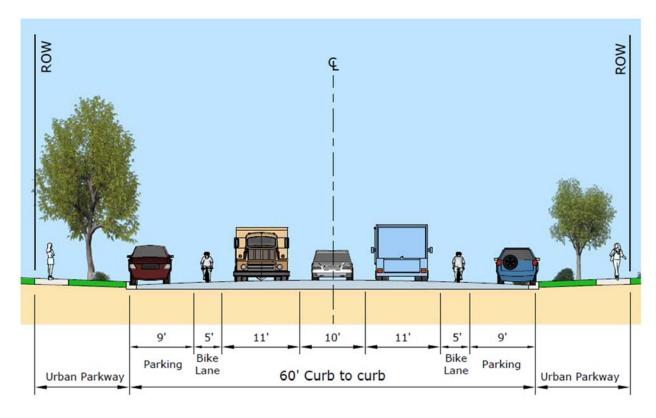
SECTION A-A: TWO LANE INDUSTRIAL COLLECTOR
